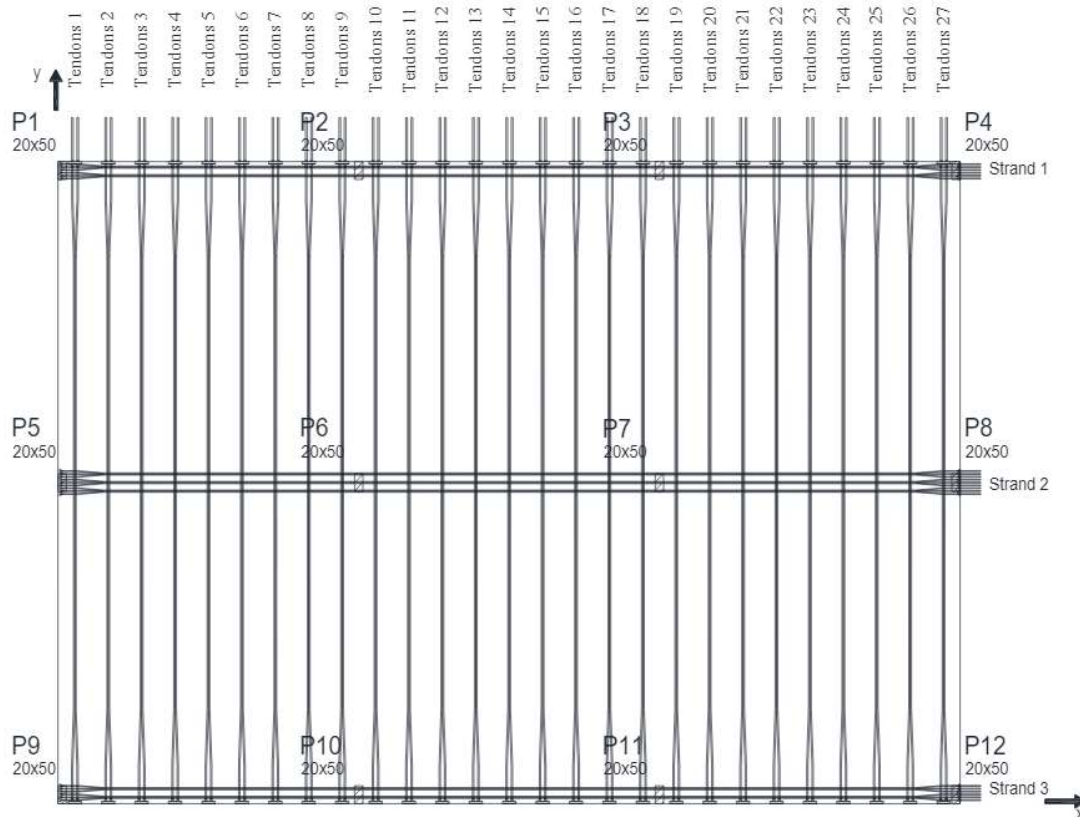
Layout of unbonded tendons and strands in a model post-tensioned slab.
